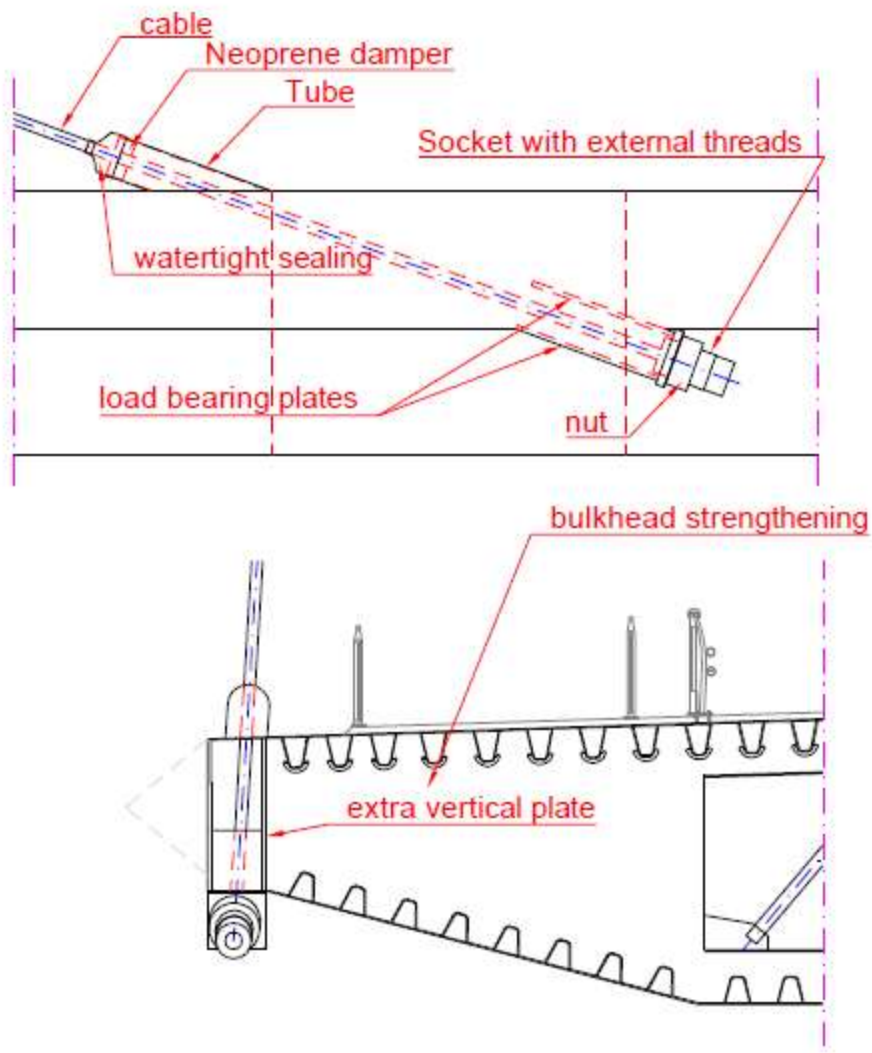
Cable attachment to bridge deck – alt. 2
